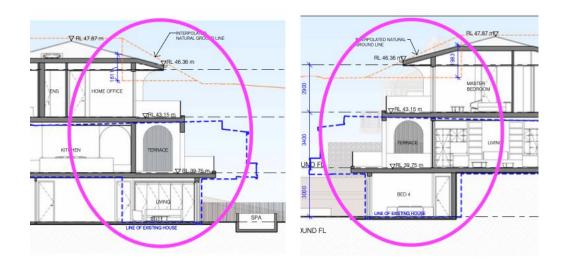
Rear of the proposed dwelling – long sections 01 and 02 (Source: iObject 2024)
